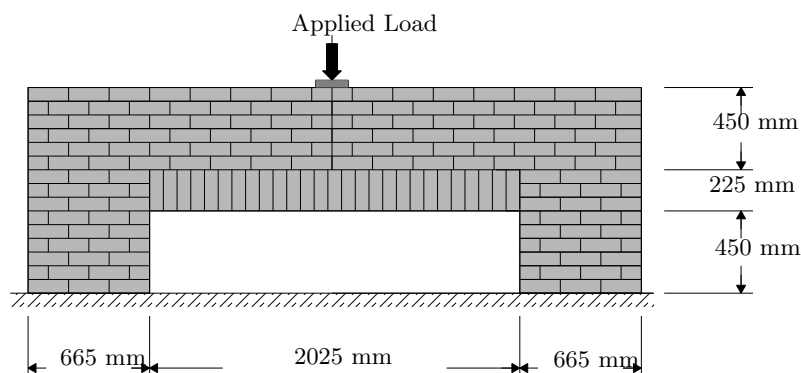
Wall panel tested in Heavy Structures Laboratory (Giamundo et al., 2014)
